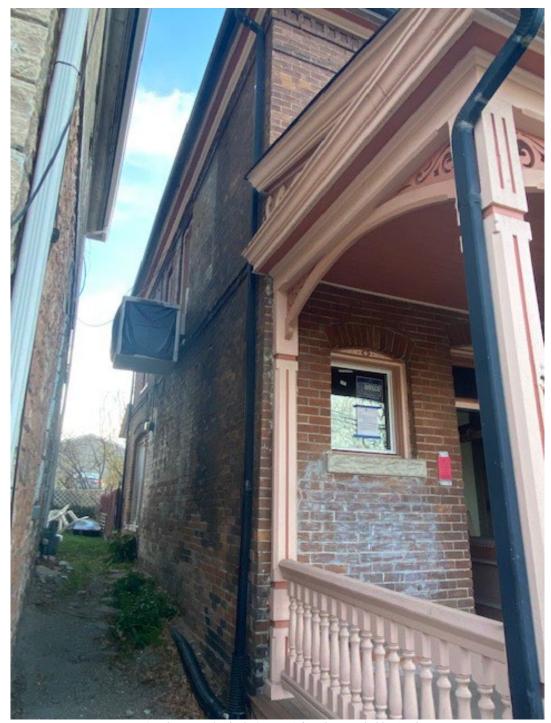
Photograph of side (eastern) facade provided by Applicant.
